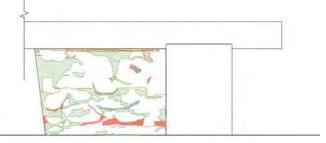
Kiva east addition west elevation condition mapping (Source: created by authors)
